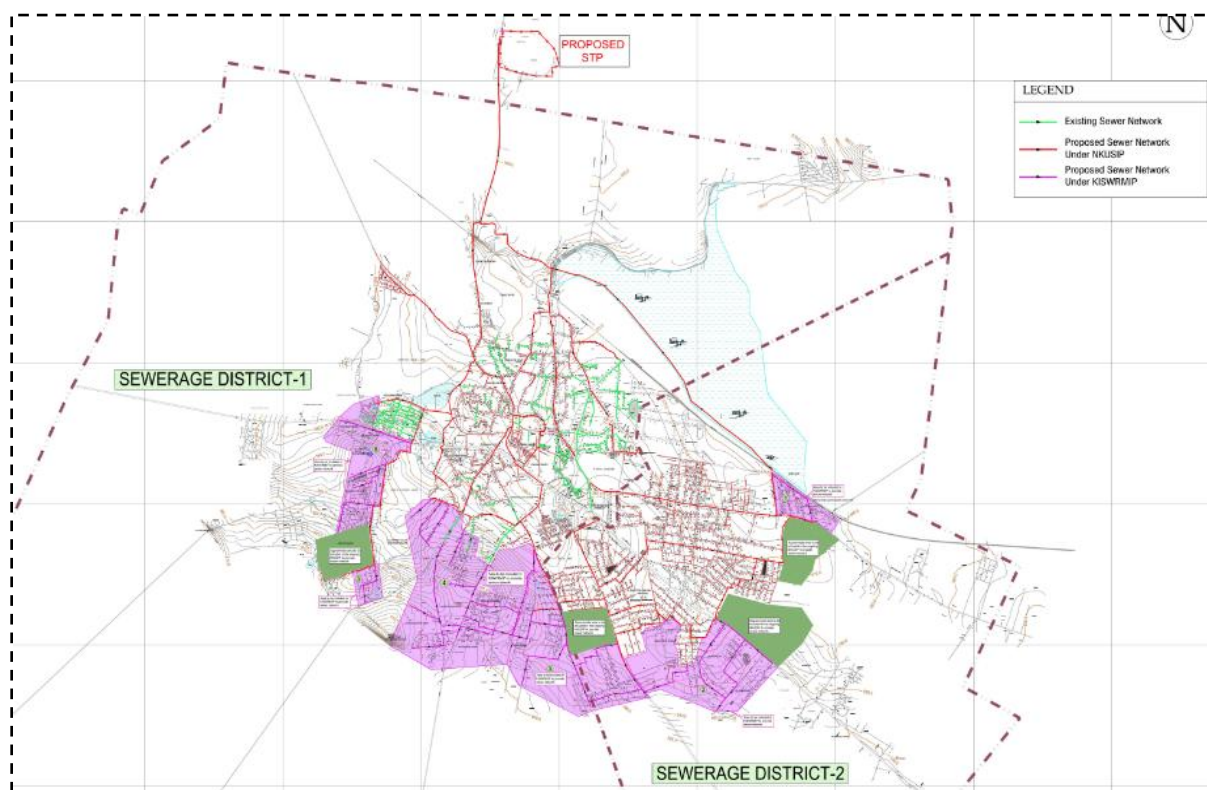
Proposed Sewer Network in Sewerage Districts 1 and 2
